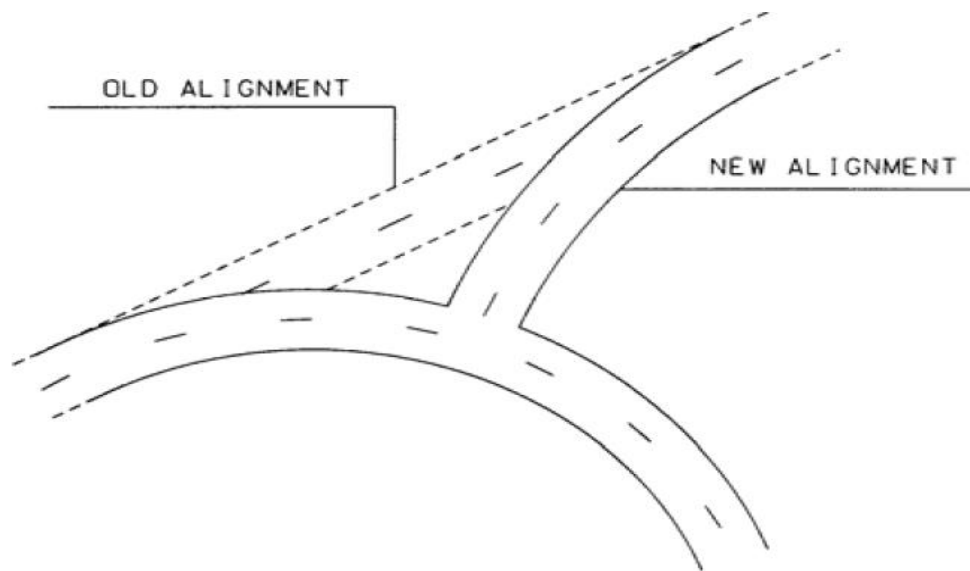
Realignment of tangent road way at intersection (Sources: UIDG, 2004)
